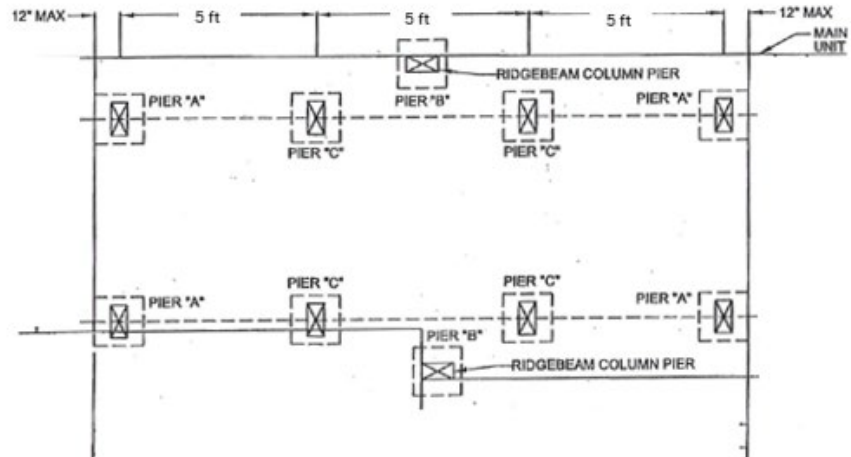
Typical Support Pier Placement and Spacing for a Tag Unit.
